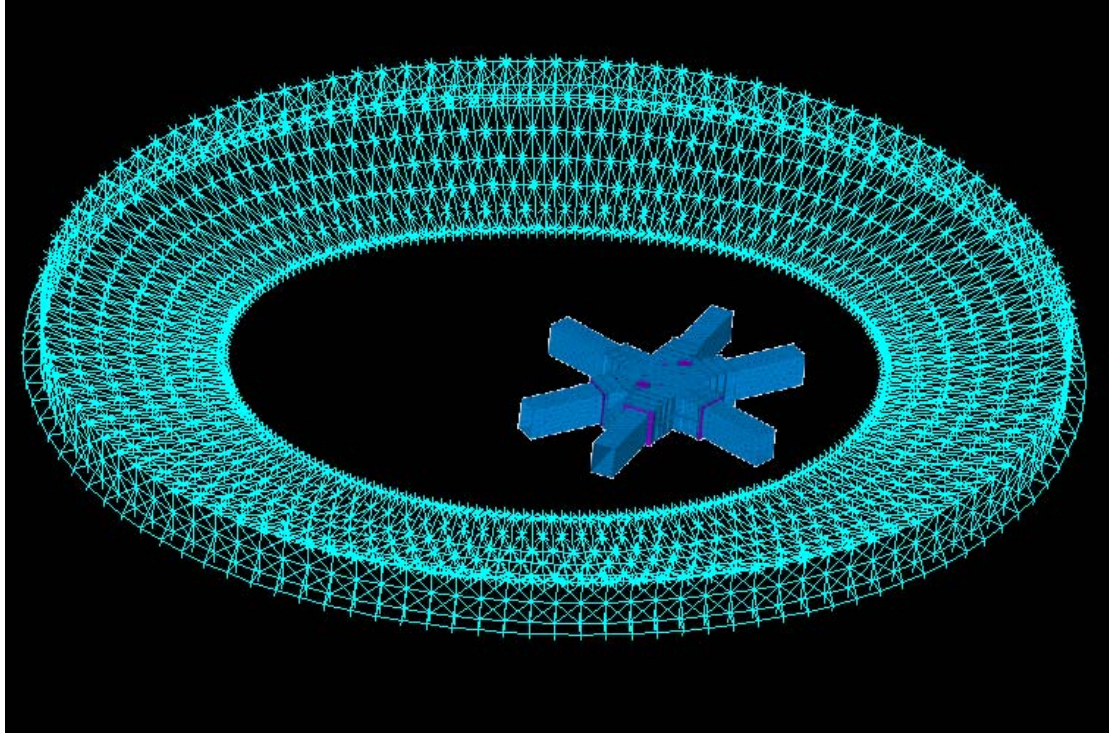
Finite element model of the whole roof bearing structure and join in detail.
